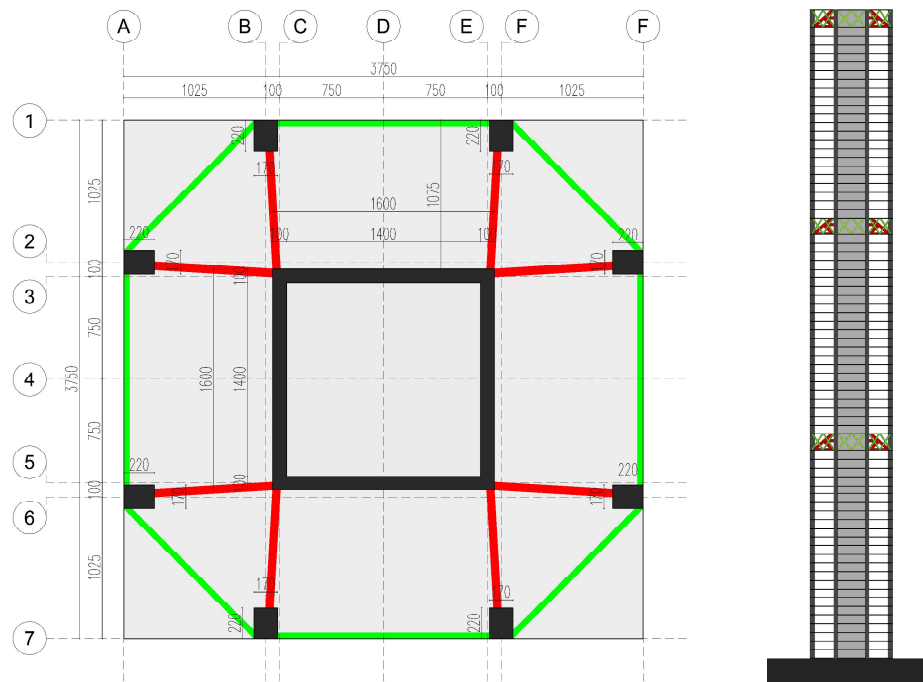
Typical floor plan and elevation of model "OF_OPT_3b" with the demonstration of outriggers and belt trusses
